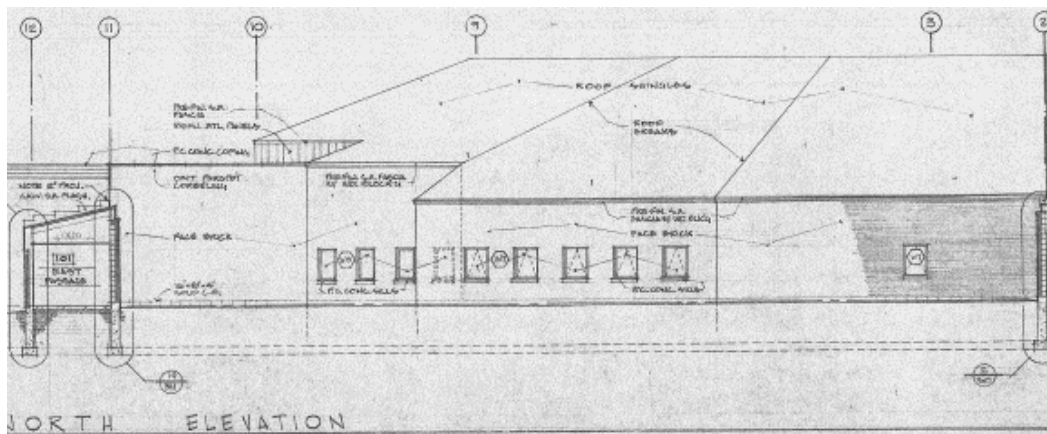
Partial elevation of north elevation showing subject roof and wall.
